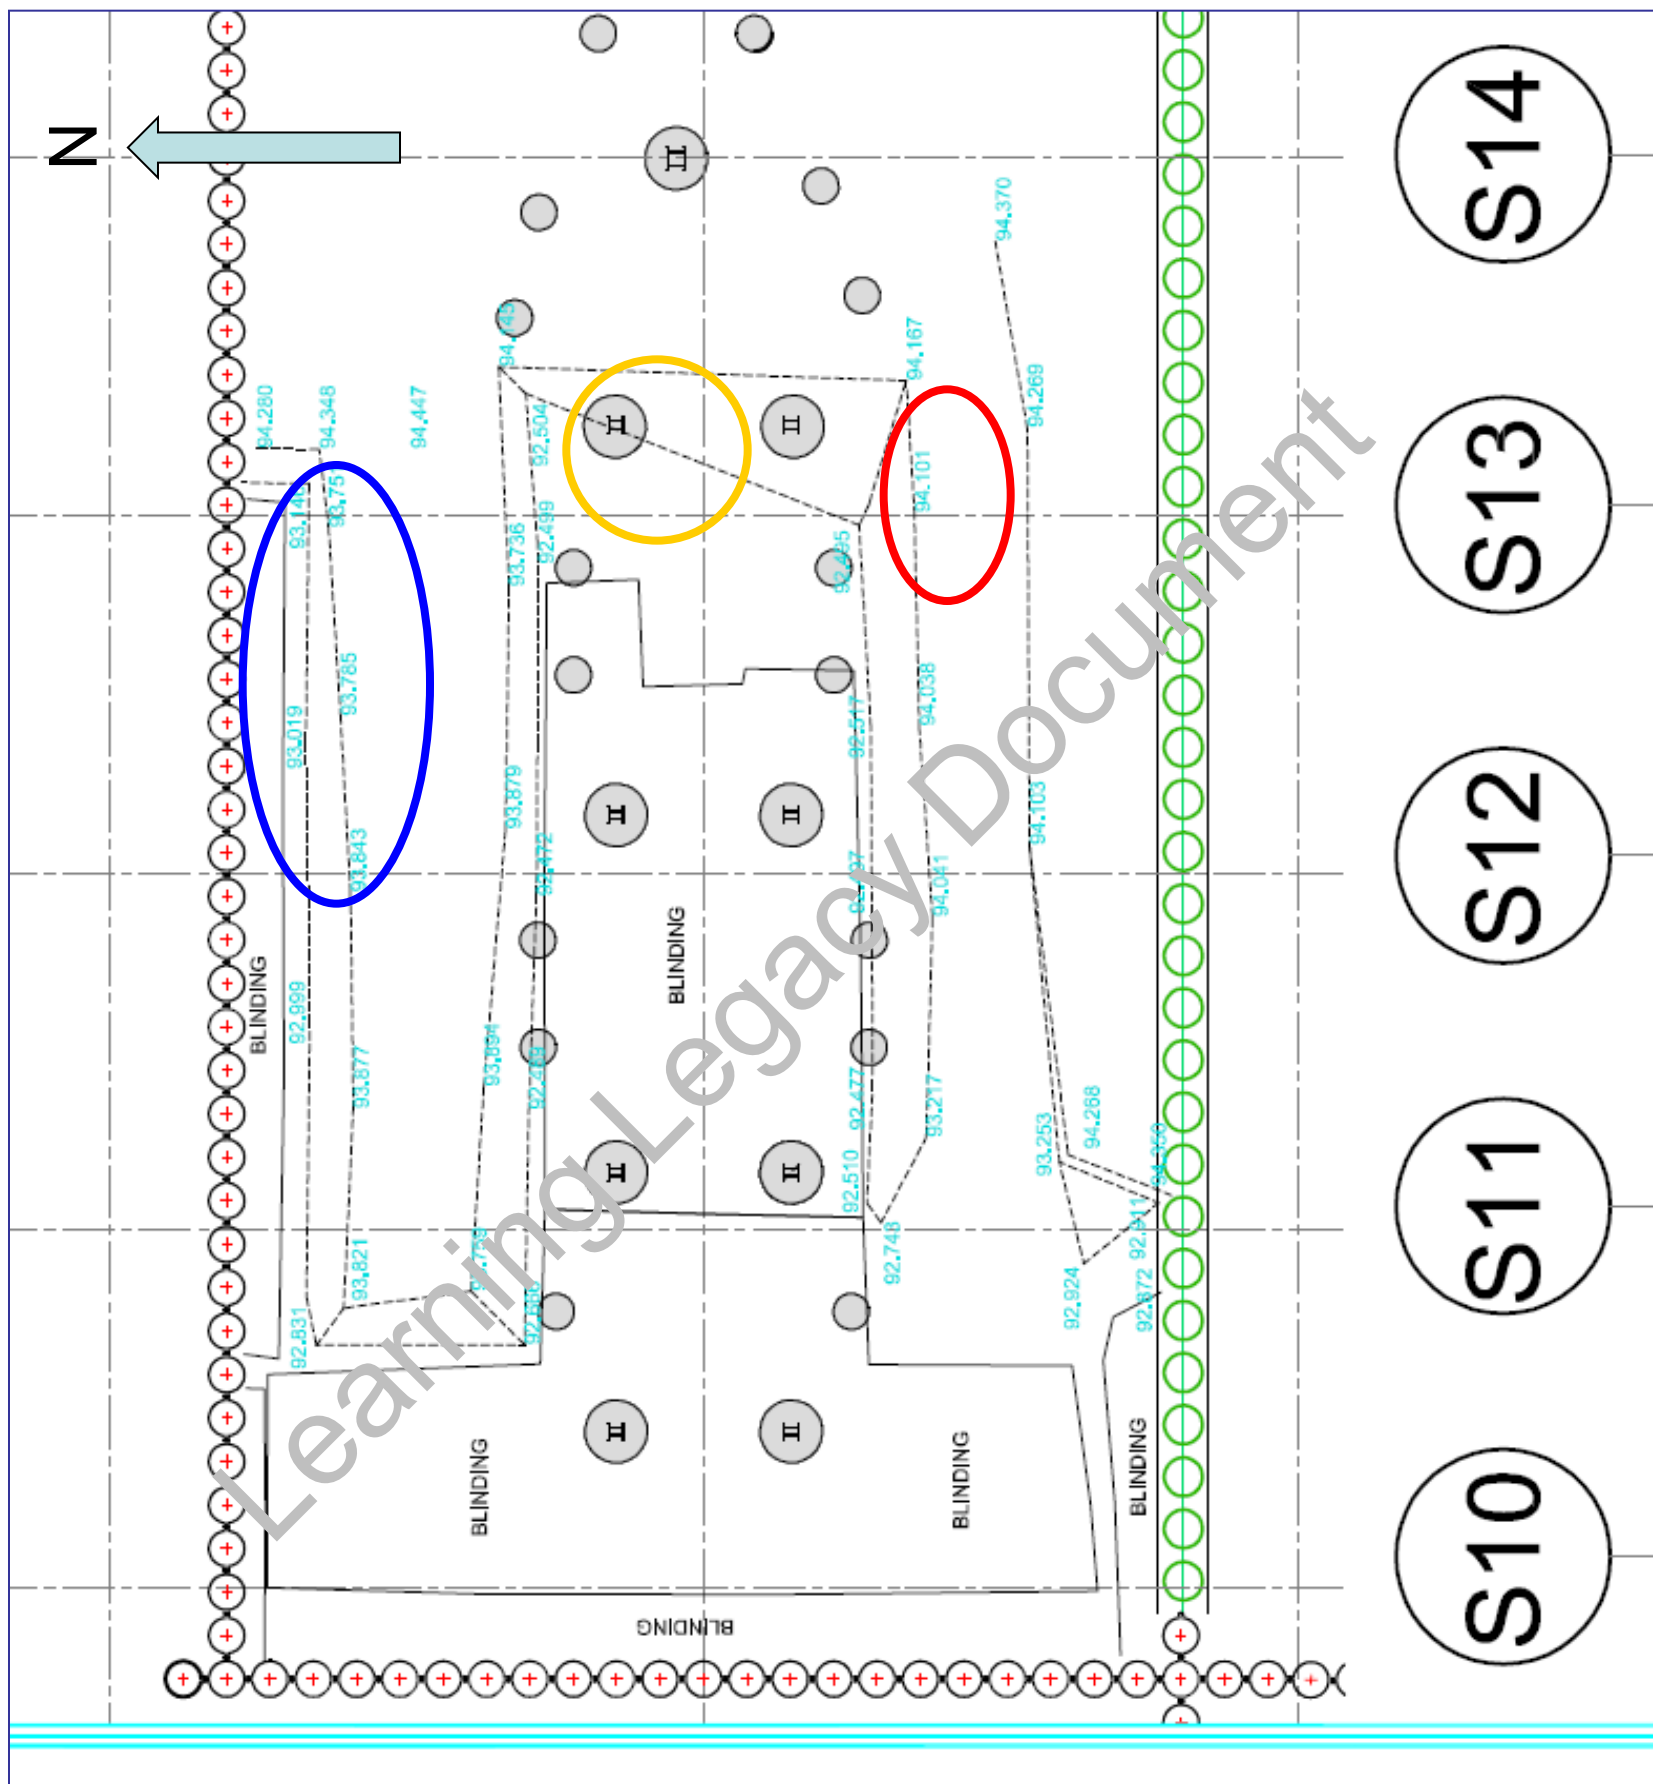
Excavation record for west end of excavation showing in same direction as Figure 6, with same areas of note, and showing excavation levels (light blue) in metres above tunnel datum.
